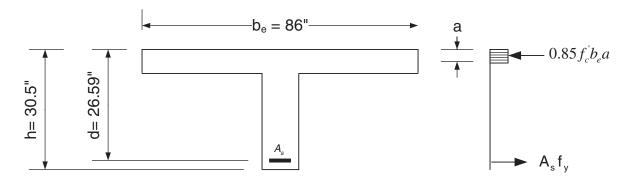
Force equilibrium on a reinforced concrete T-beam
